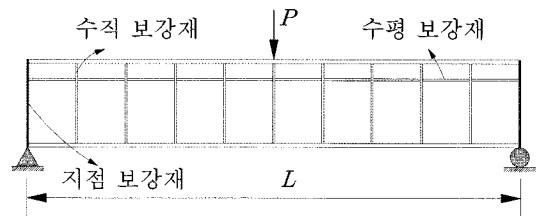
Plate girder with stiffeners(Lcase A,  $n_{sv}=9$ ).
